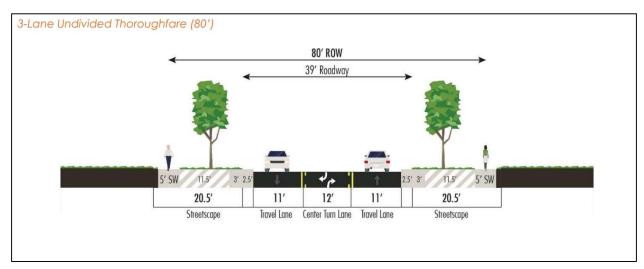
Three-Lane Undivided Thoroughfare Cross-Section
